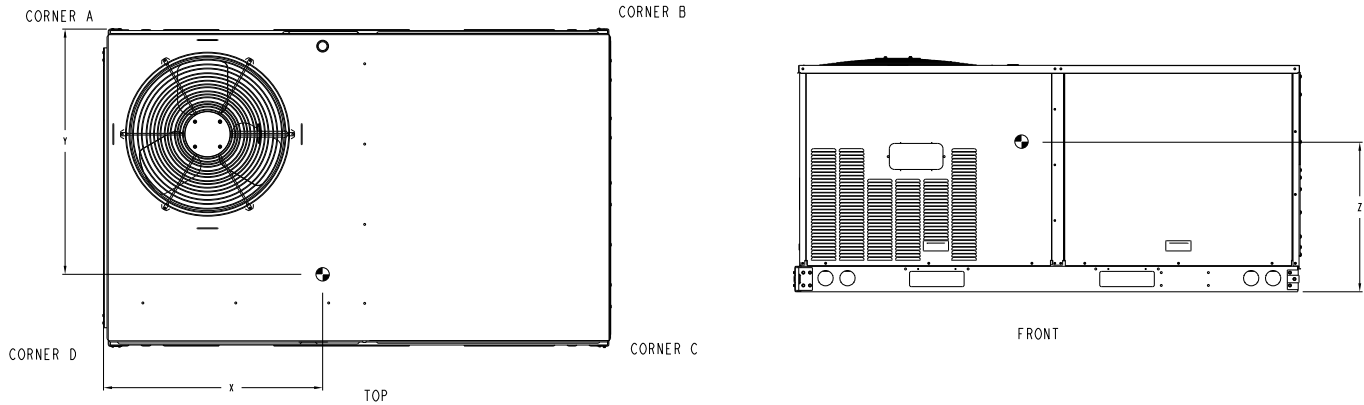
Dimensions RHH 036-060 (Sheet 1 of 2)
